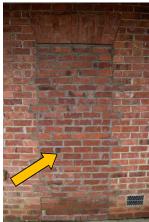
Exterior view showing brick infill of original opening in the west elevation wall with flat segmental brick the west elevation wall.
